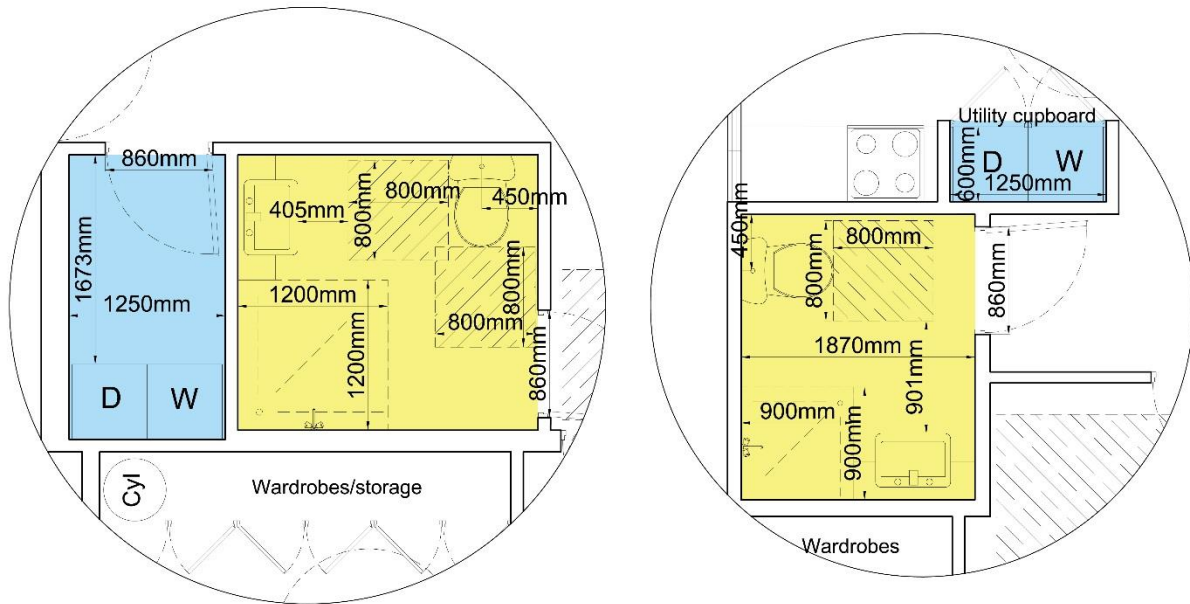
Landry and bathroom/wetroom dimensions for conversion to separate units - villa (left) and state house (right)
